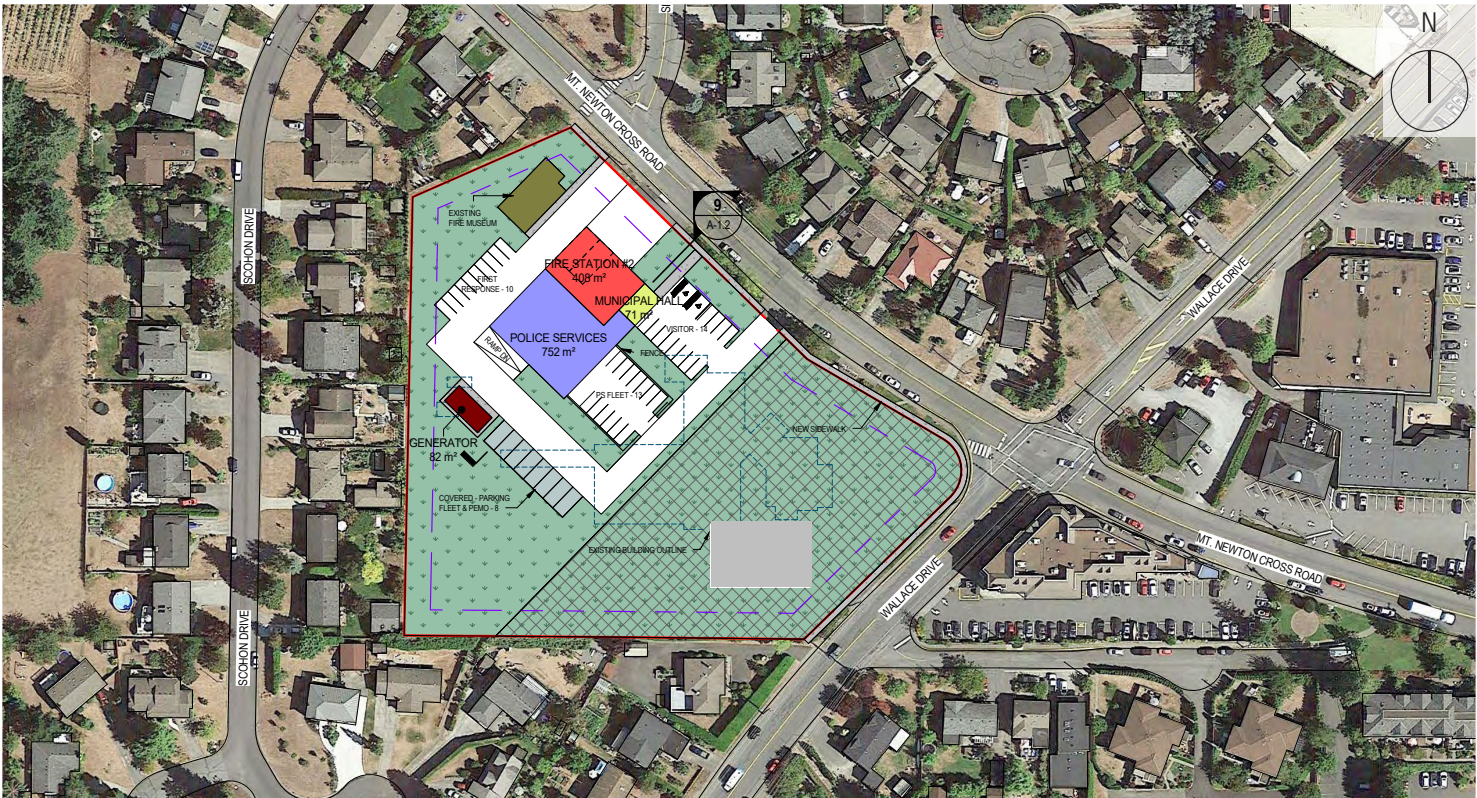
1903 Mt Newton Cross Road Site Concept: Site Distribution Concept 1
